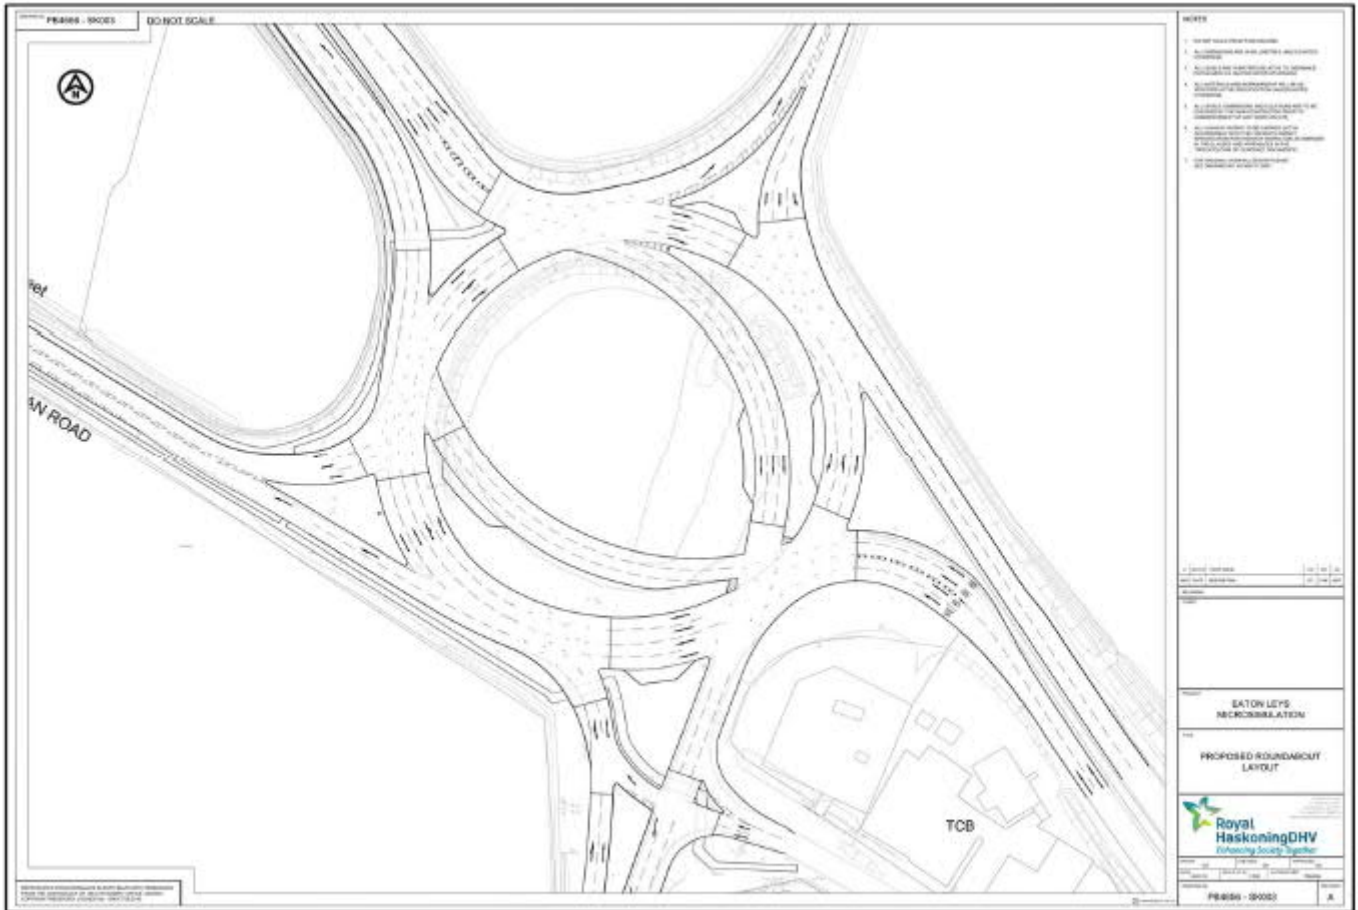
Kelly's Kitchen Proposed Layout (with single A5 north to south lane)
